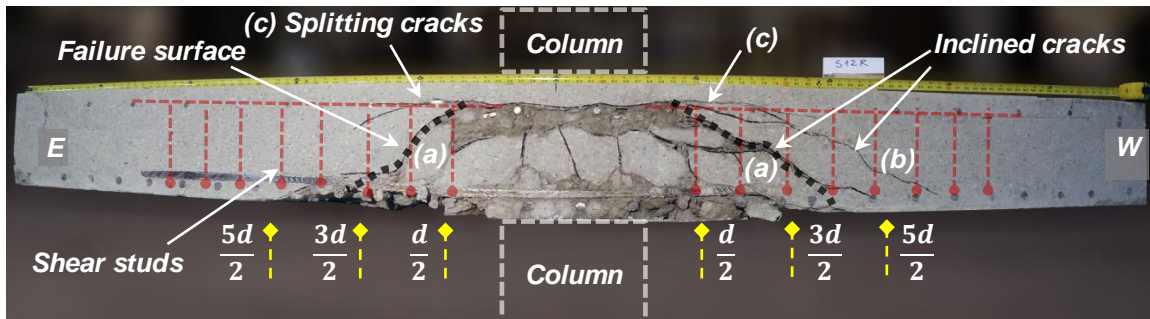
Cracks on a cut section close to the north face of the column for Specimen S12R
